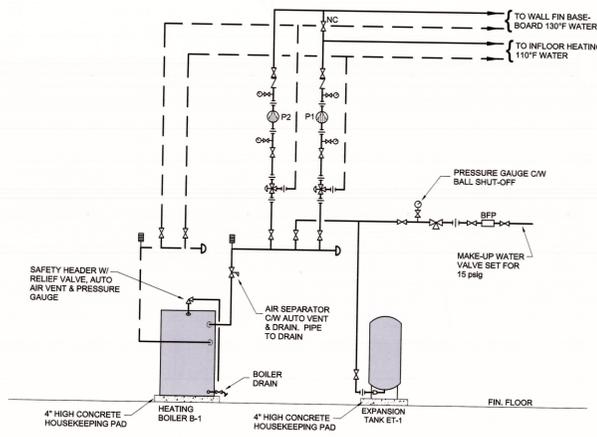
/721 TYPICAL FLOOR PIPING ARRANGEMENT N.T.S.
